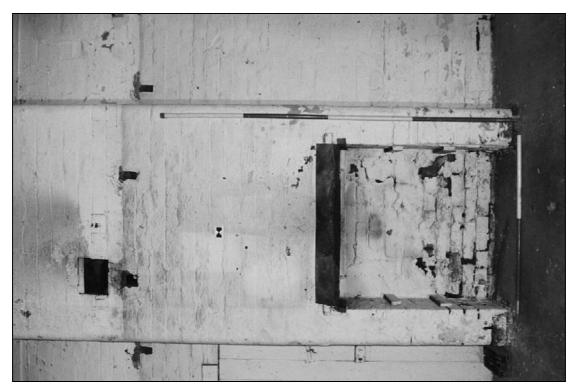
Detail of window within former doorway and doorway within former window, north wall of G20, south range (film 3.4)
